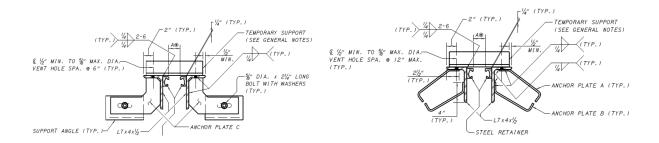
ODOT strip seal joint design (Concrete I-beam)
